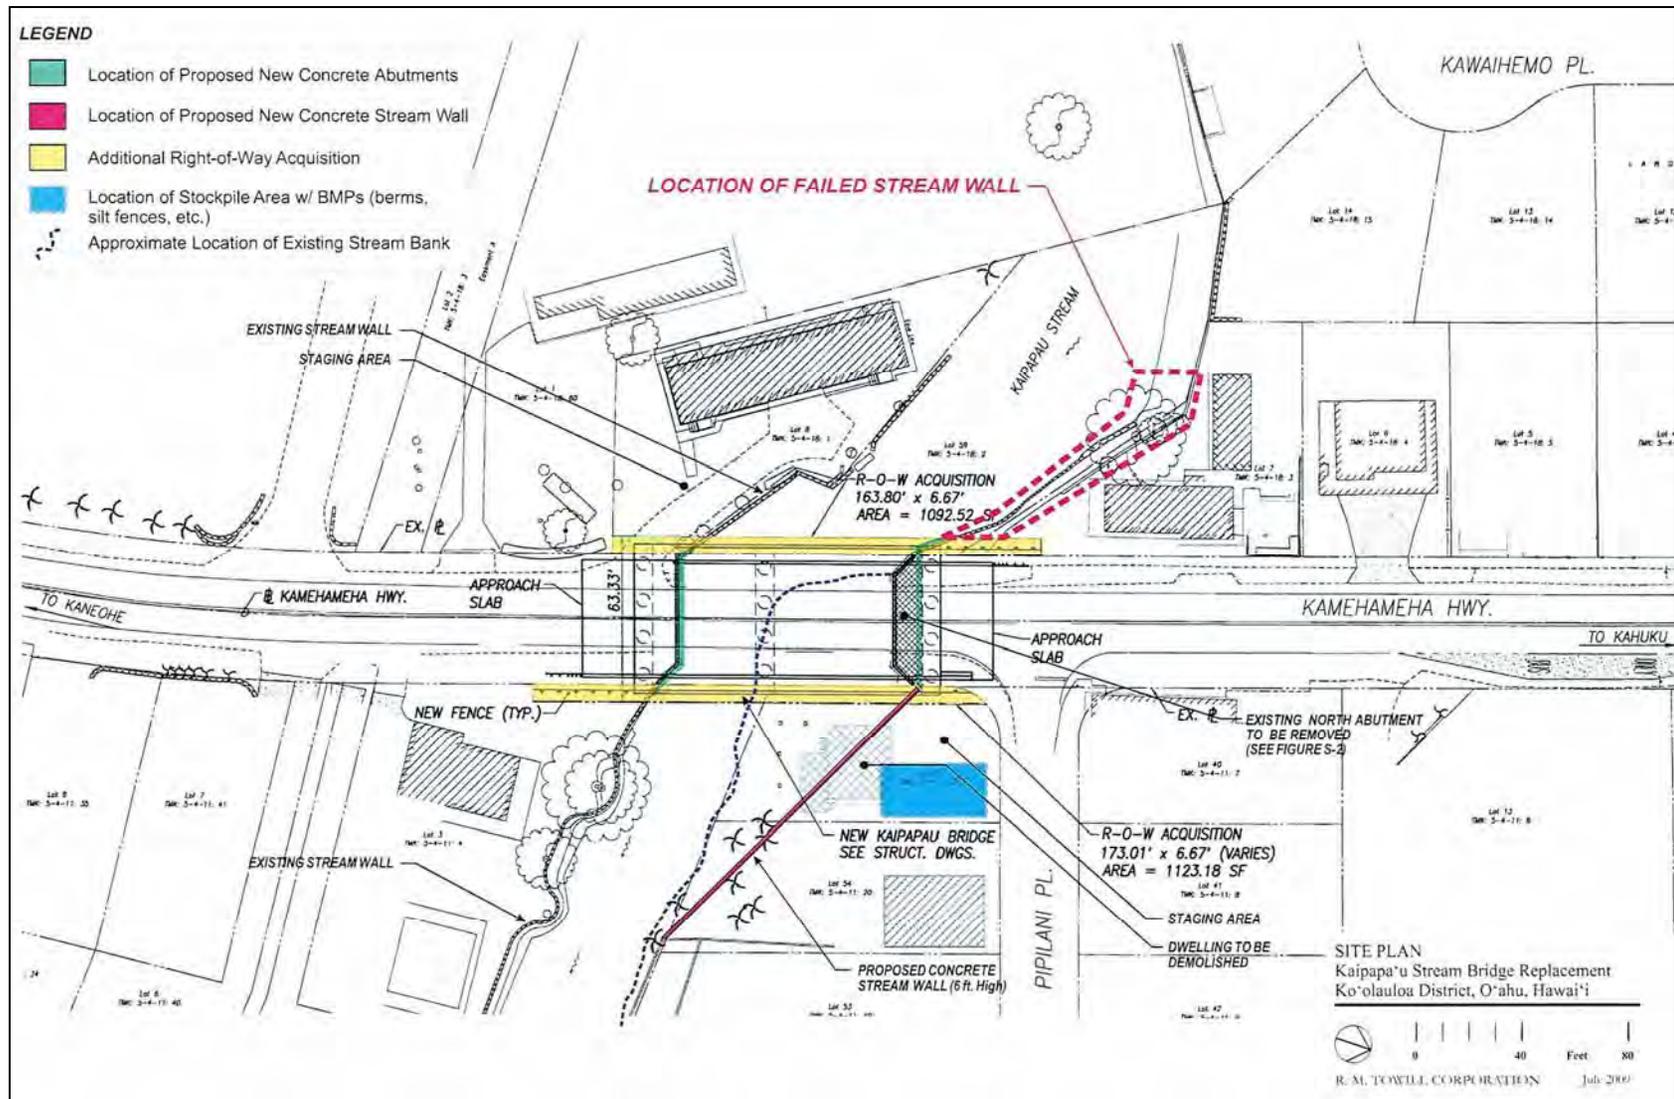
Kaipapa'u Stream Bridge Replacement Site Plan
